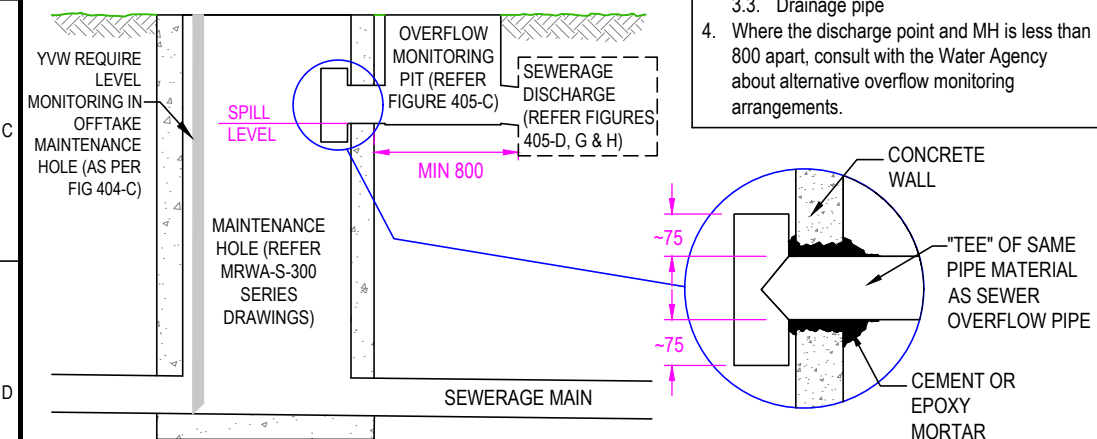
B: GENERAL ARRANGEMENT B (WHERE THERE IS NOT ADEQUATE DISTANCE BETWEEN M.H AND DISCHARGE POINT TO INSTALL BACK FALLING SEWER)
